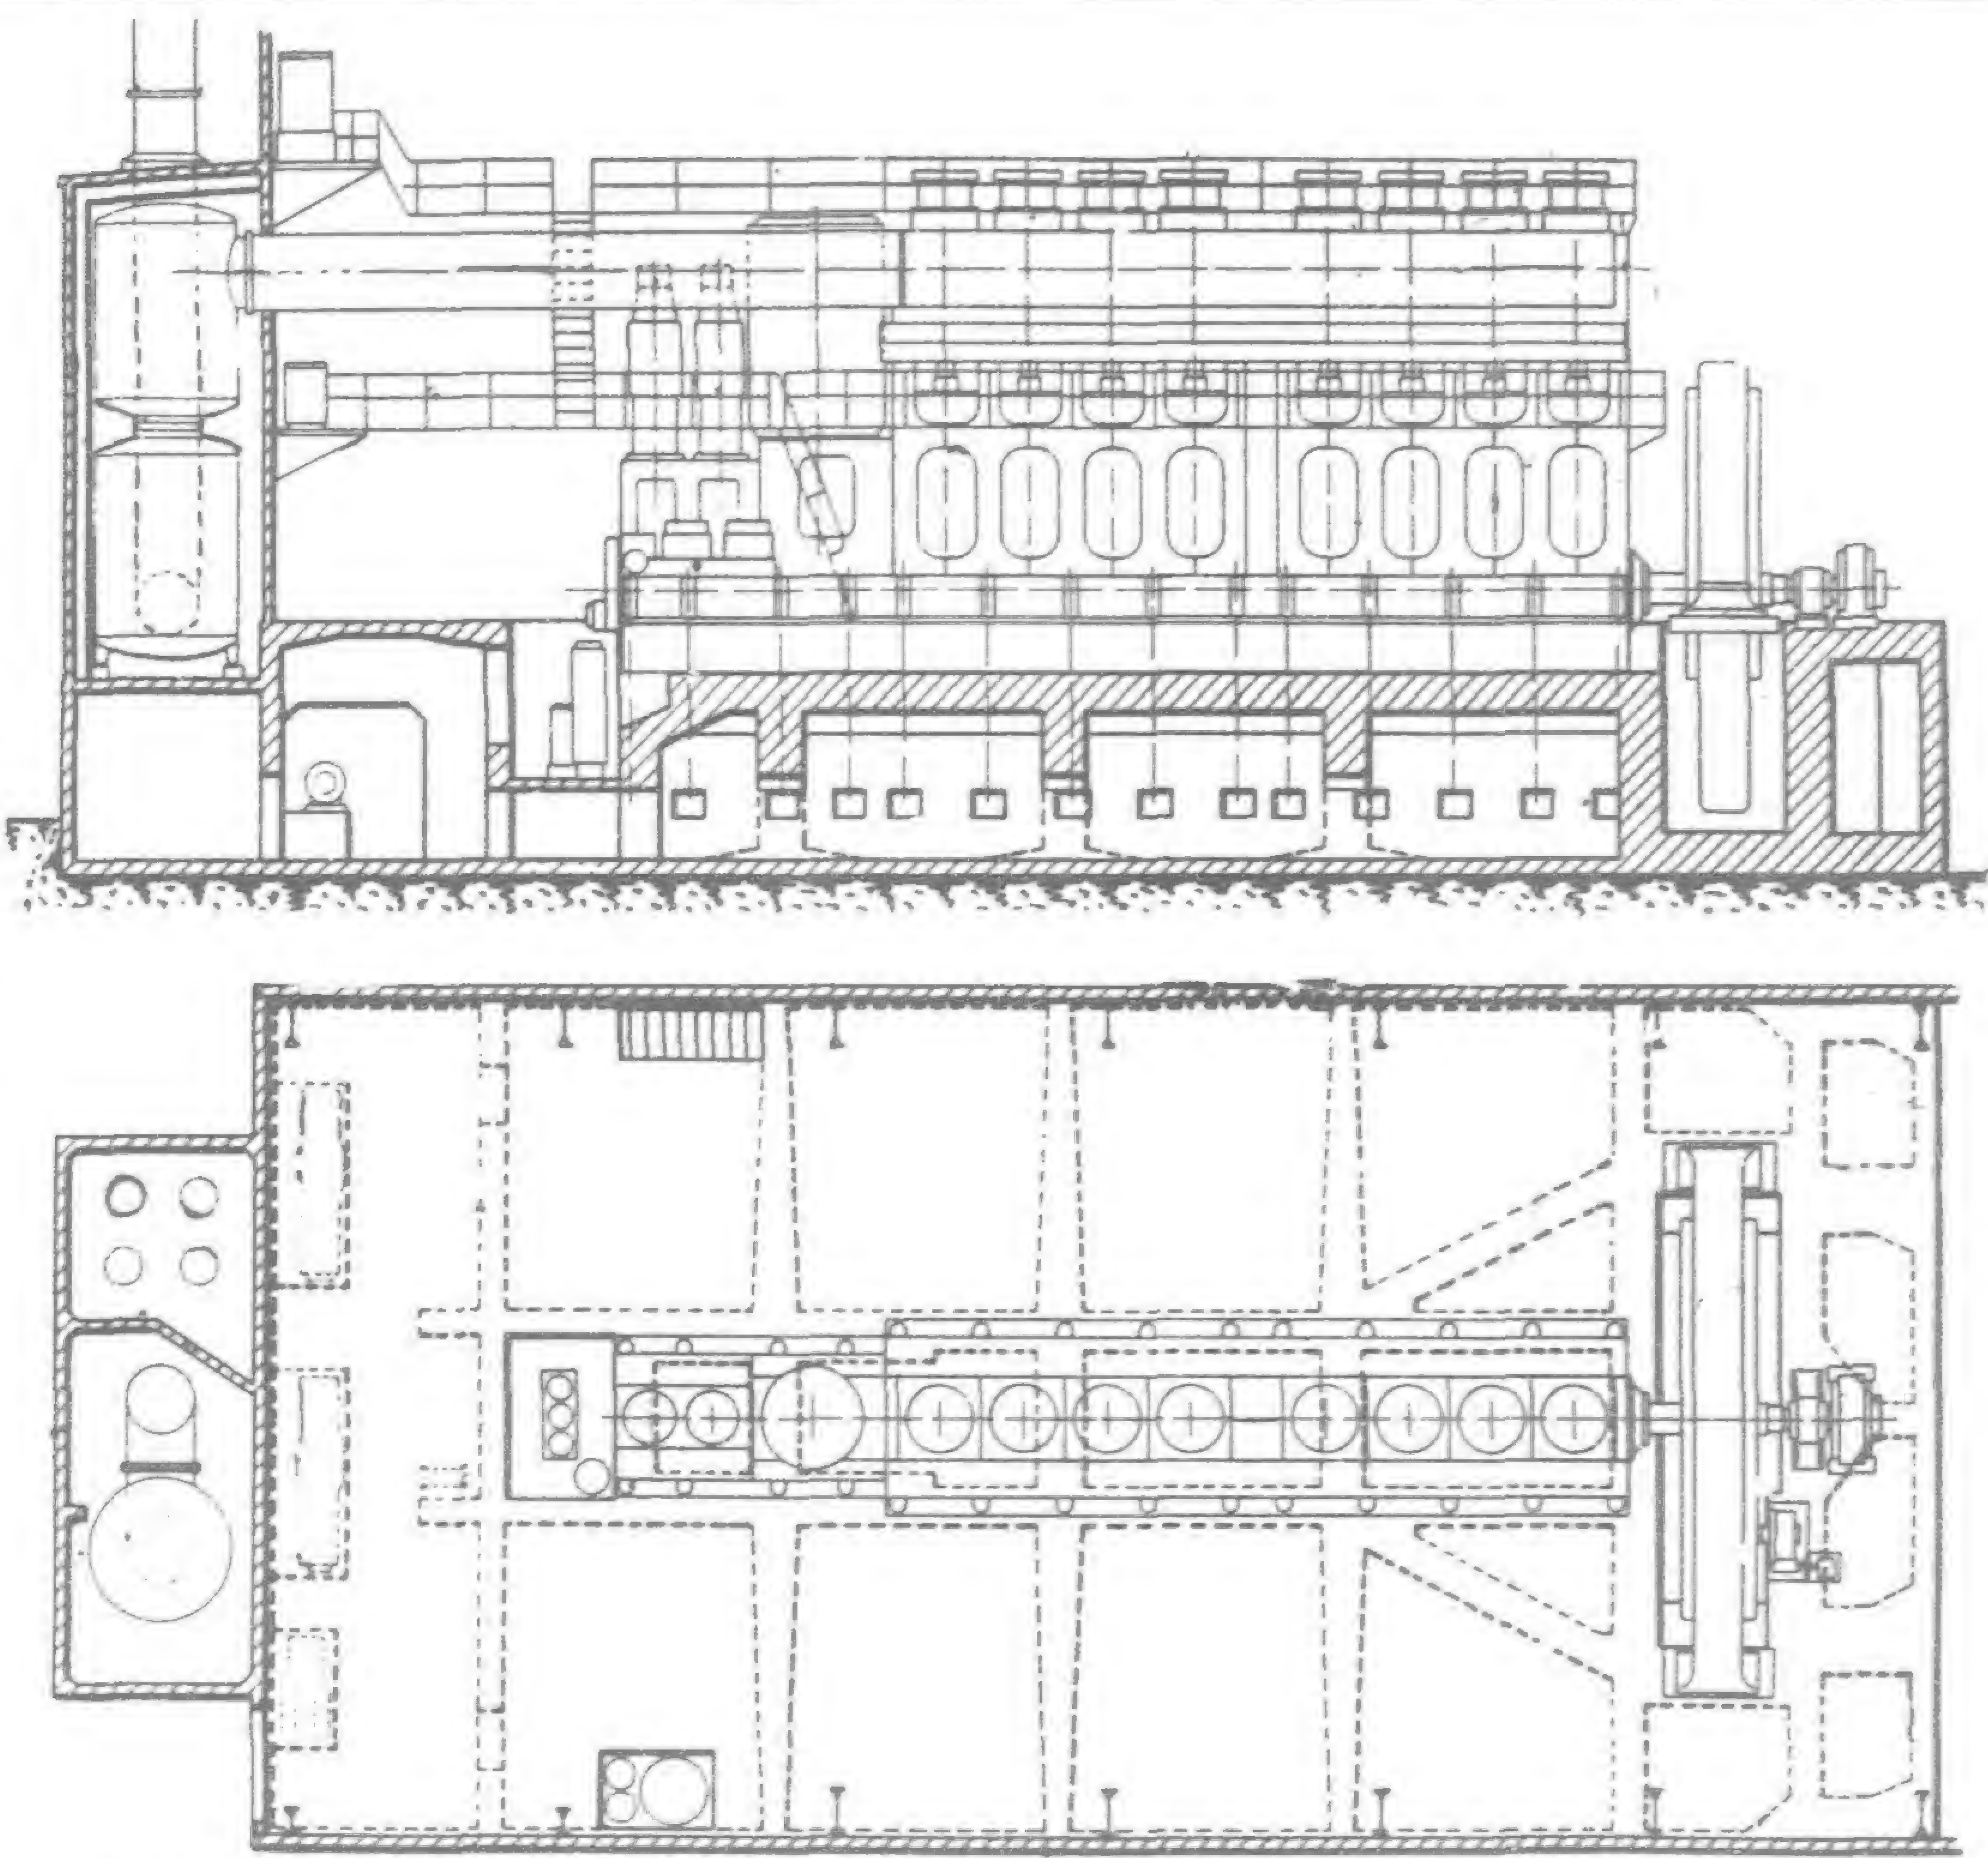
General plan and elevation of 13,700 b.h.p. Sulzer diesel generating plant
